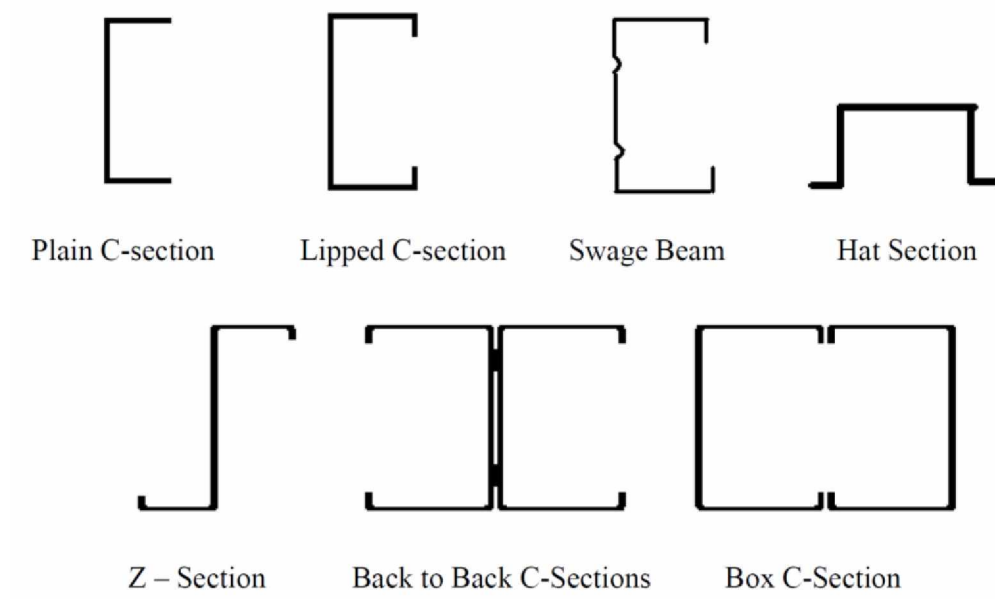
Typical cold-formed, thin-walled, open cross-section steel members [1]
